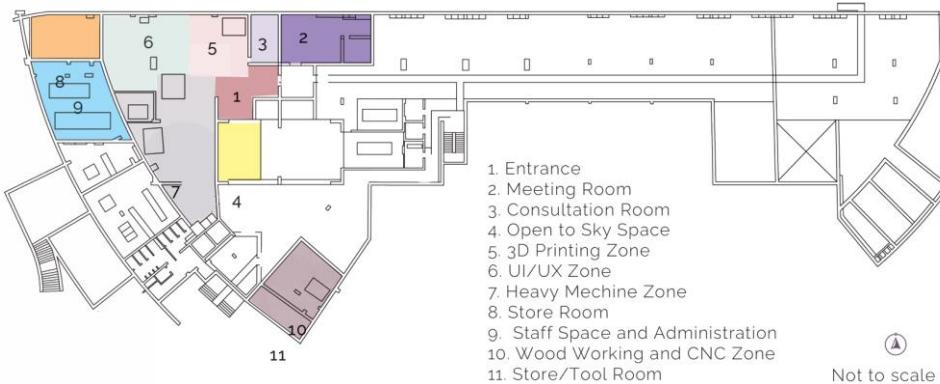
Floor Plan of Super Fab Lab Kochi (Author)
